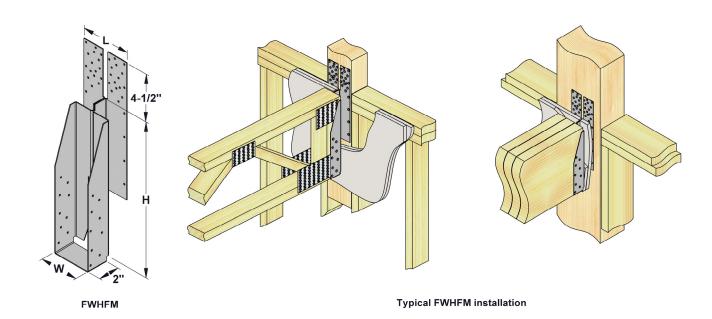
FWHFM FACE MOUNT FIRE WALL HANGER AND TYPICAL INSTALLATION
